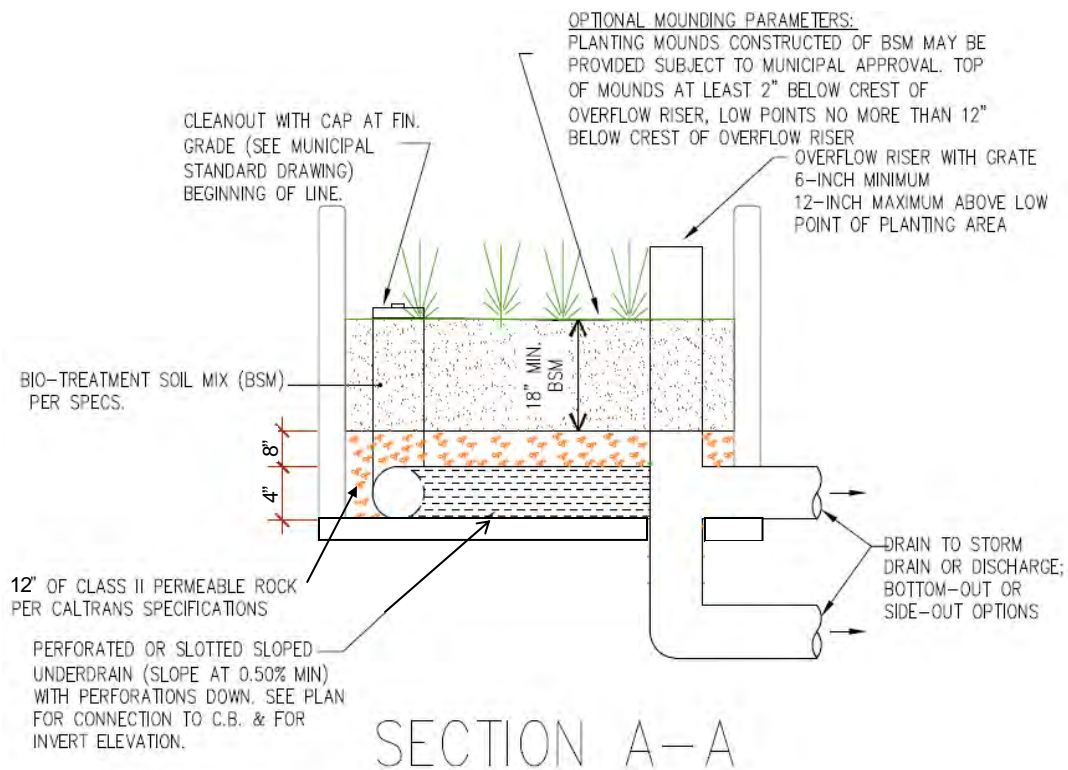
Cross section A-A of flow-through planter, shows side view of underdrain
